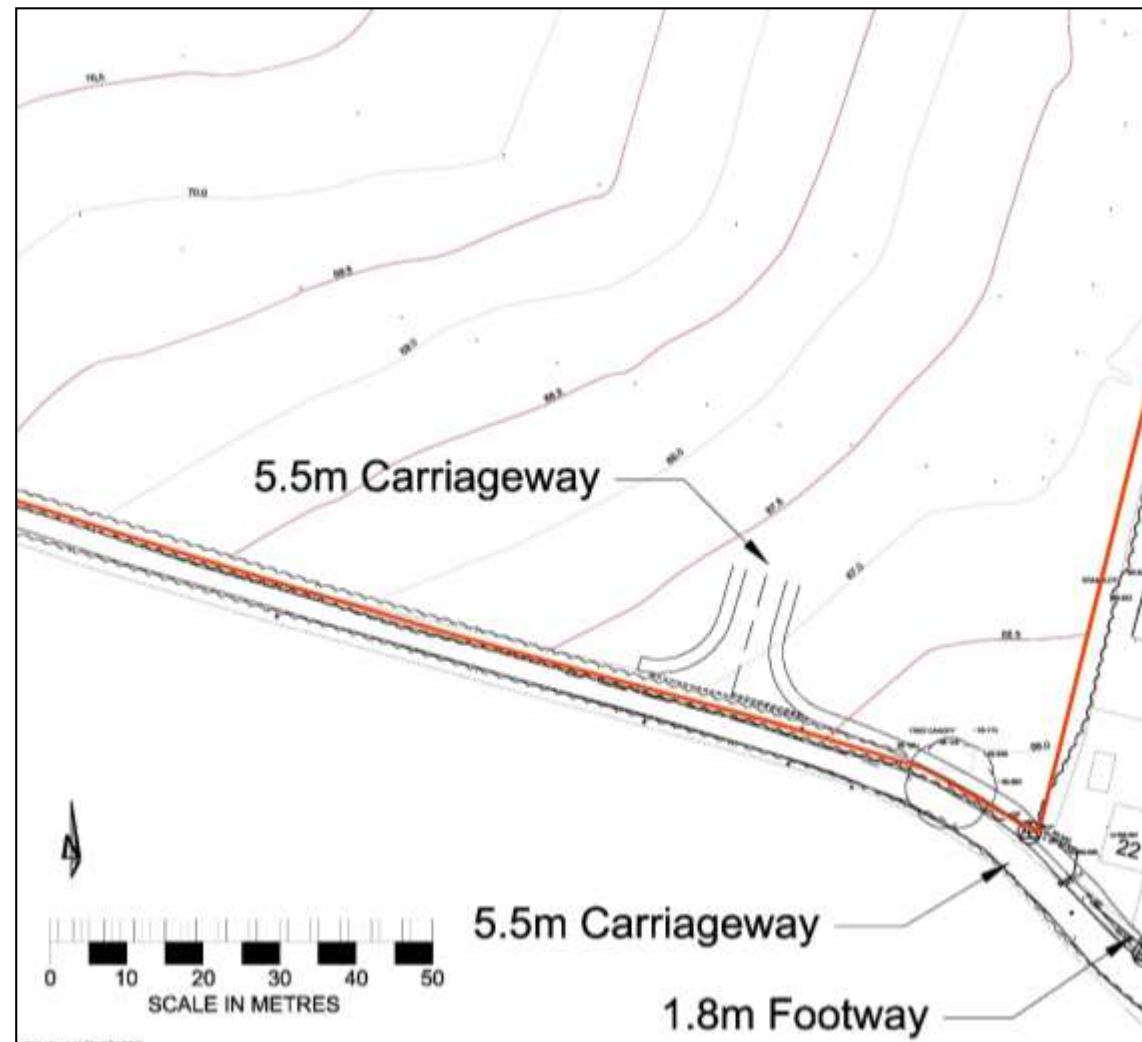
Bondfield Lane Proposed Access Arrangements
